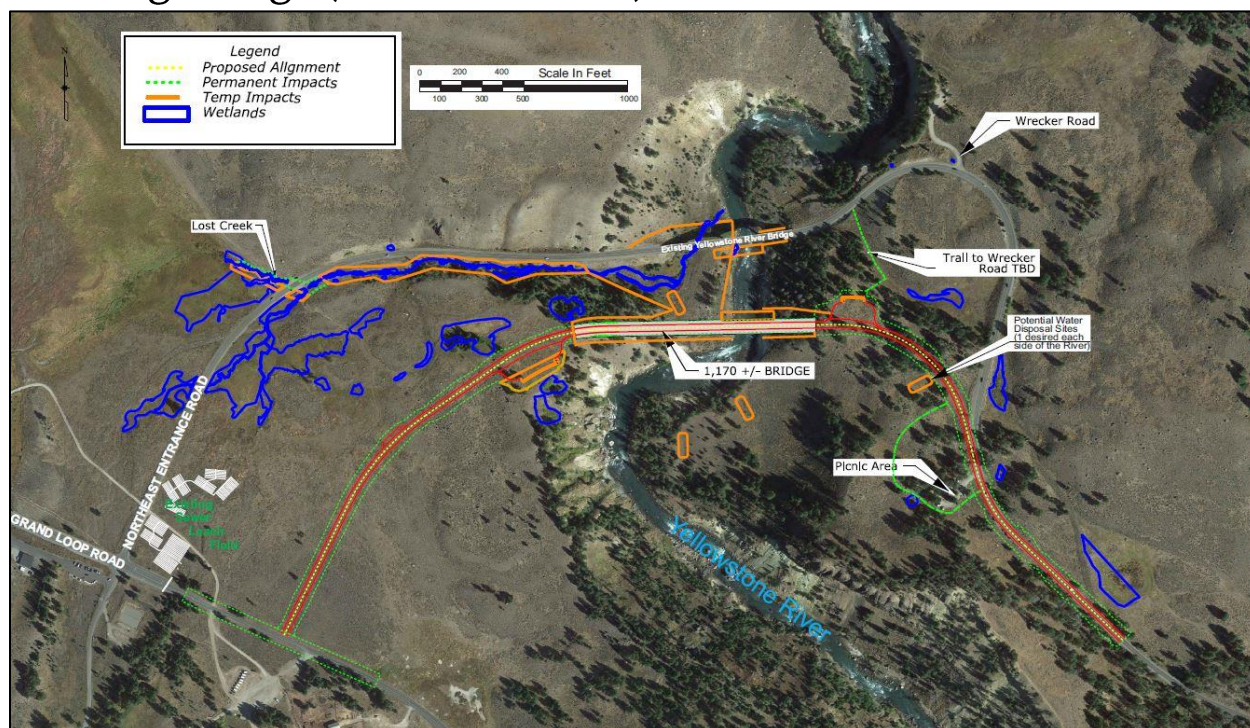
Alternative B-Replace Bridge on New Alignment South of Existing Bridge (NPS Preferred).
